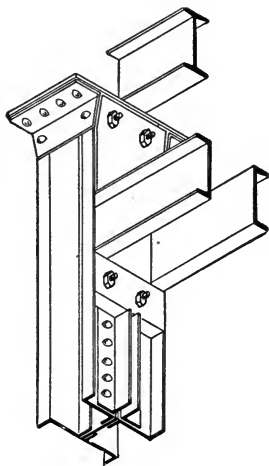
Detail of Channel-Strut Connections. Venetian Building.
